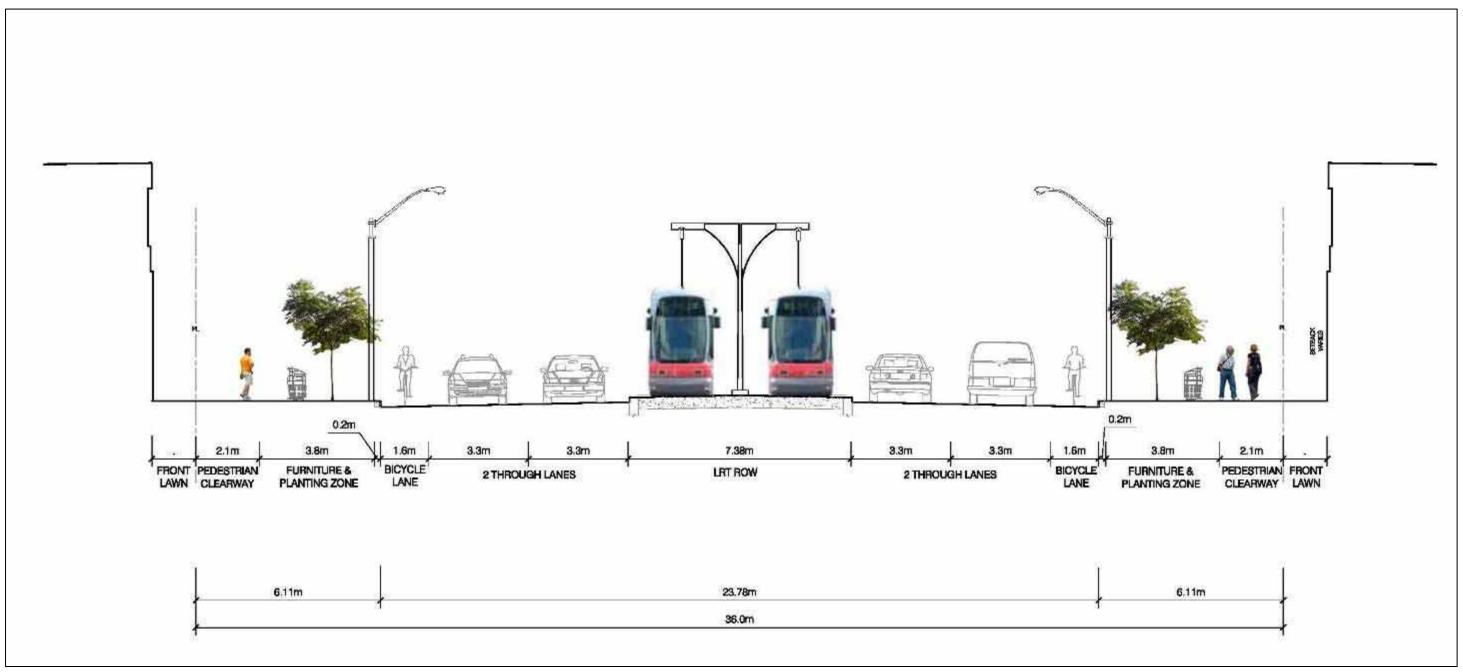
Typical Midblock Cross Section – 36m (Sectors Yonge St. to Jane St.; Weston Rd. to Humber College)
